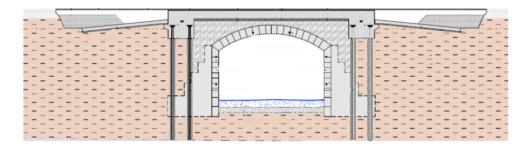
Strengthening solution of Formigosa bridge. Longitudinal cross section (Infraestruturas de Portugal, 2012).
